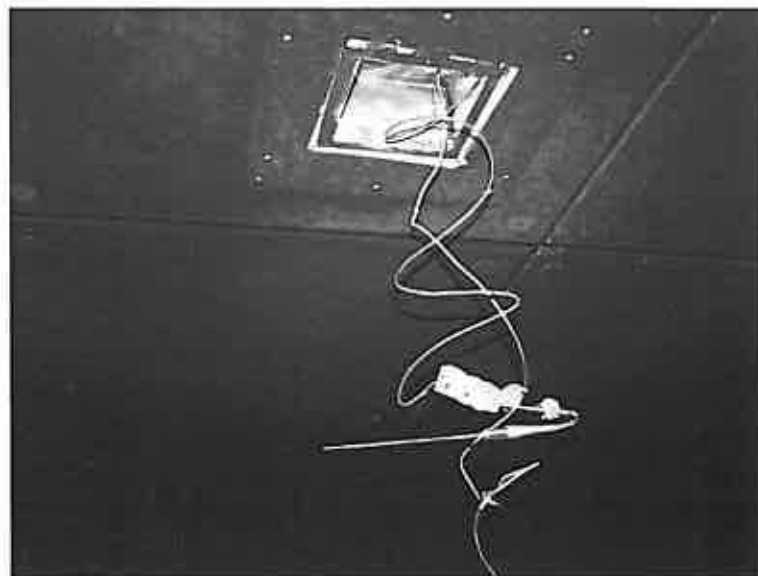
, Box Assemblies Dry and Properly Insulated on Inspection
